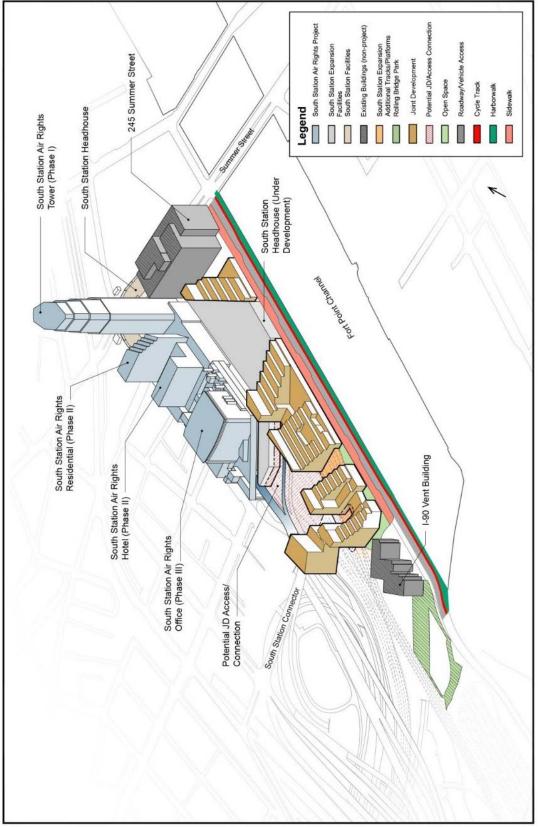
South Station Site Joint/Private Development Alternative 2, Massing Concept
